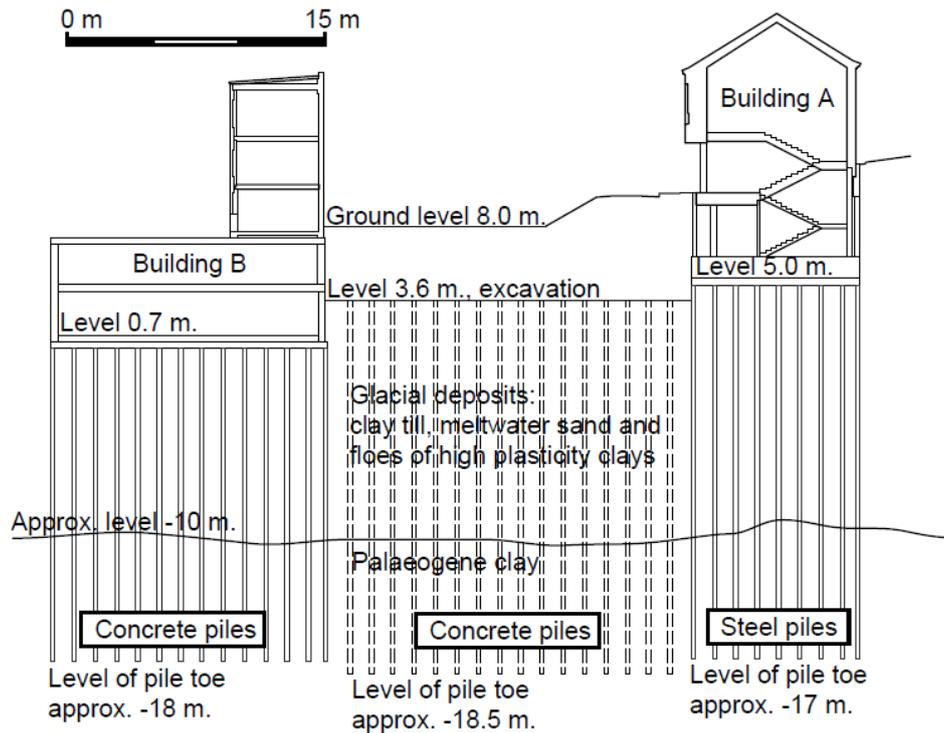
Cross section of the basement excavation for Aarhus Story and the adjacent buildings (Southeast to North-western direction).
